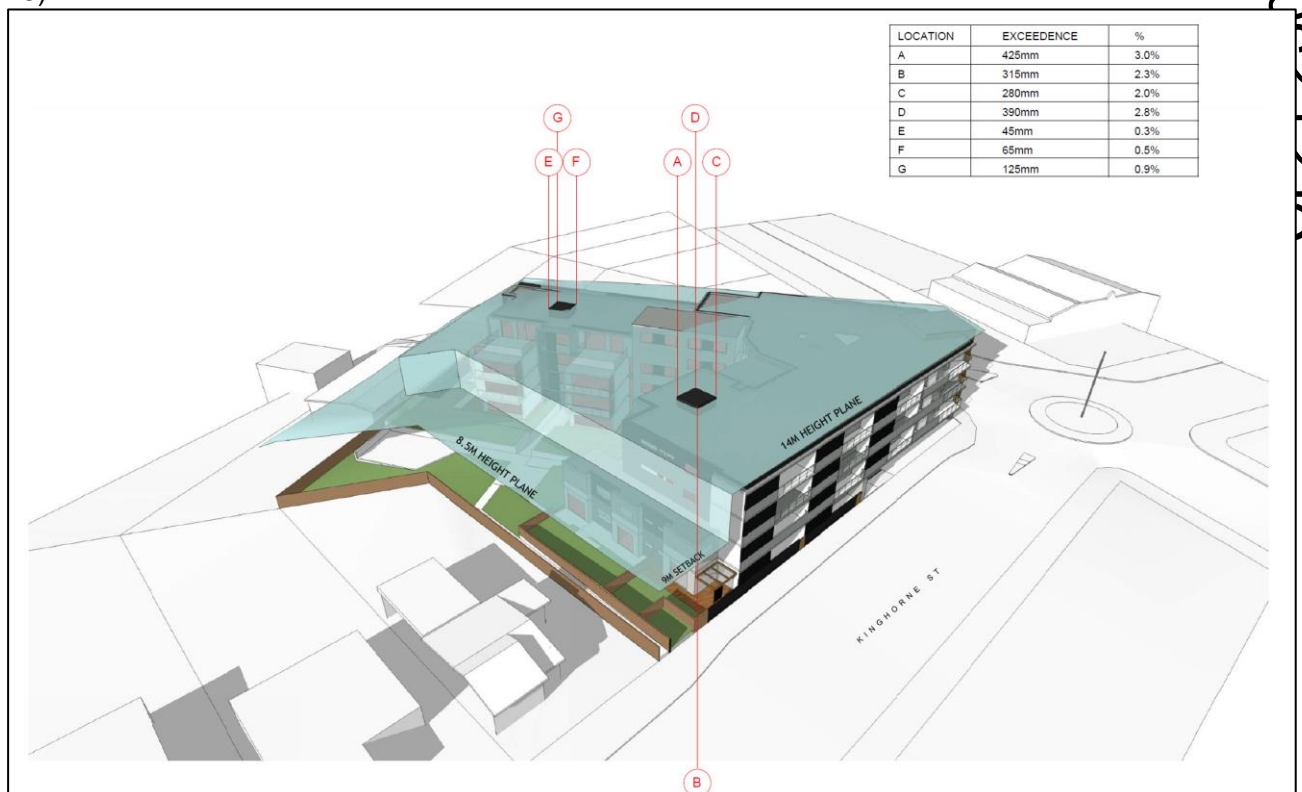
Height plane instructions relating to the 14.0m (N2) maximum building height - south-eastern view from Kinghorne Street.
